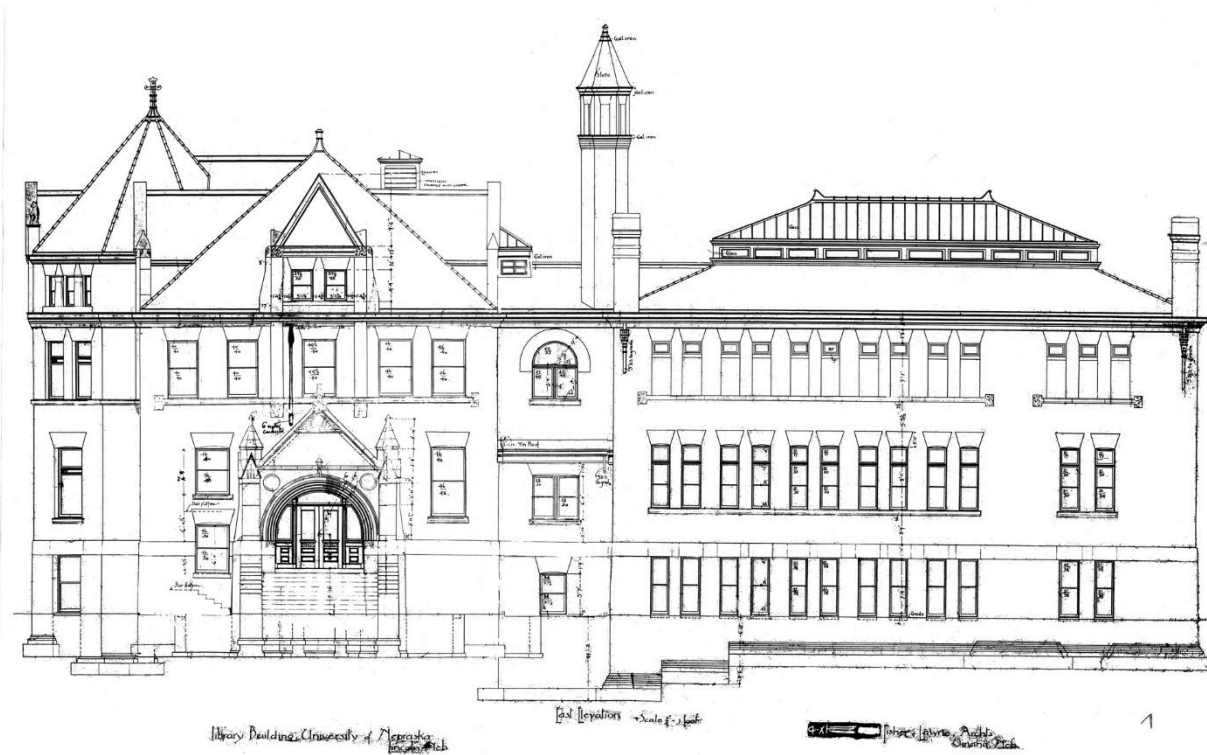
Exterior Elevation of Architecture Hall. Sketch. Retrieved from: <http://historicbuildings.unl.edu/index.html>
